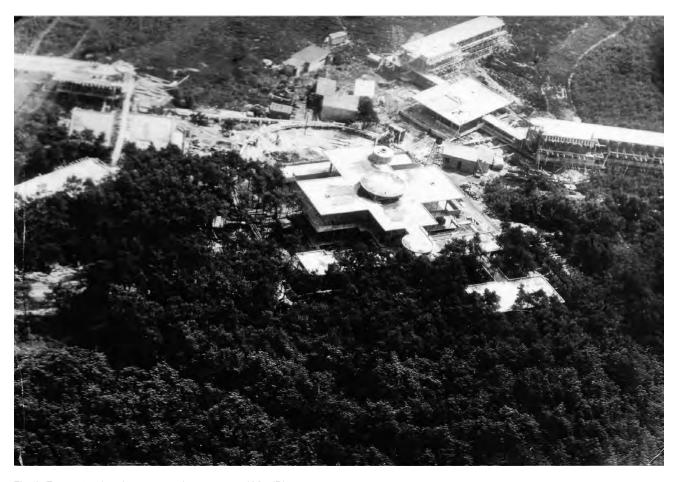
Zonnestraal under construction, summer 1927 (Photo collection Jan Molema)
